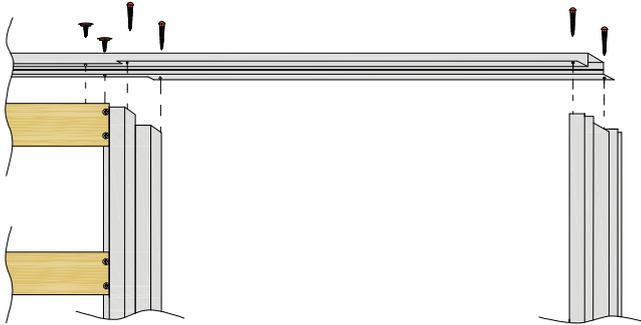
| Metinno Aluminium Cavity Sliding Door
